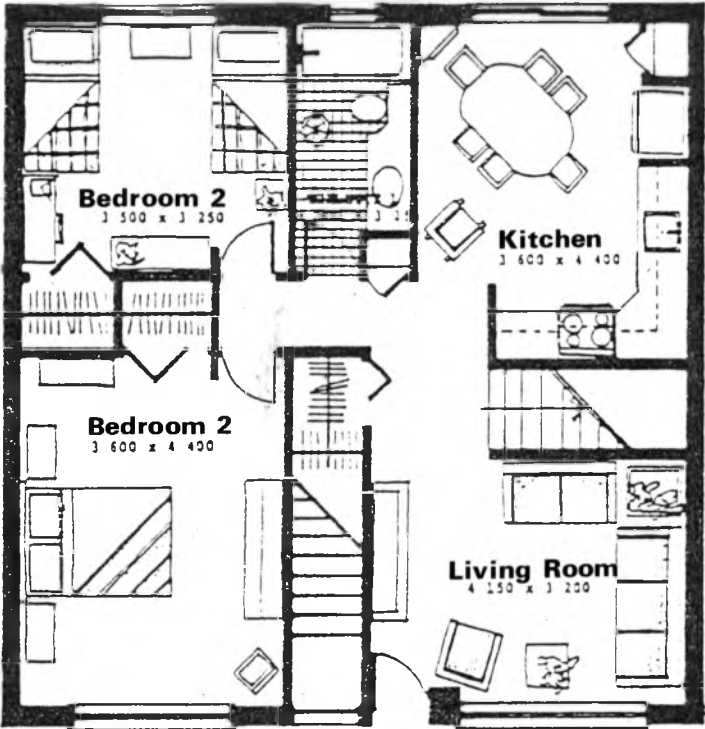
Basement plan of the duplex occupied by Household 01. The dining room in this dwelling offers very little possibility for re-arranging the furniture due to the traffic needs and to the virtual absence of walls against which furniture can be placed (0170). Scale: 1/100.
